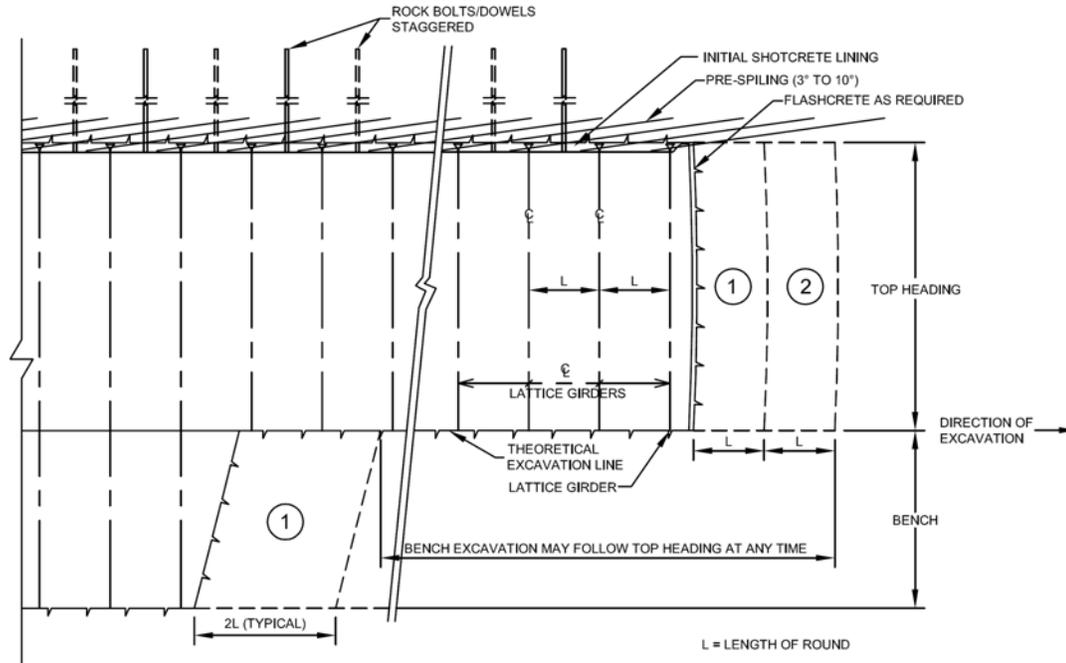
Prototypical Longitudinal Excavation and Support Class (ESC)
